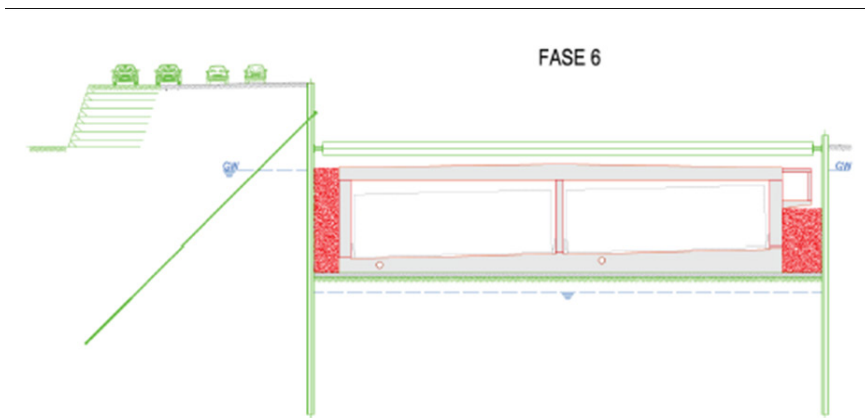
Typical cross section for closed part of the Verdiepte ligging
